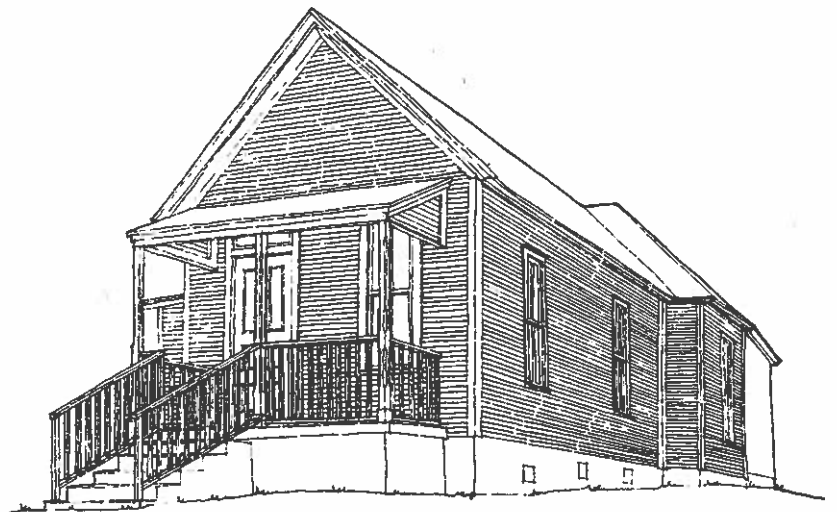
The Shotgun. After rehabilitation, this house has narrow wood siding with wood trim, wood windows, wood columns with bevelled corners, new railing, moved meter box and panelled door with transom, (above).
